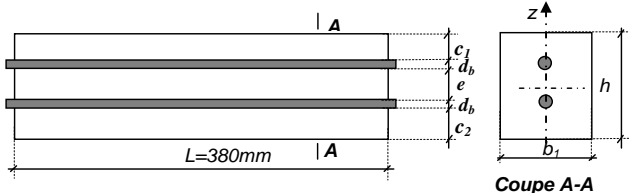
Concrete beam reinforced with 2 GFRP bars modeled
